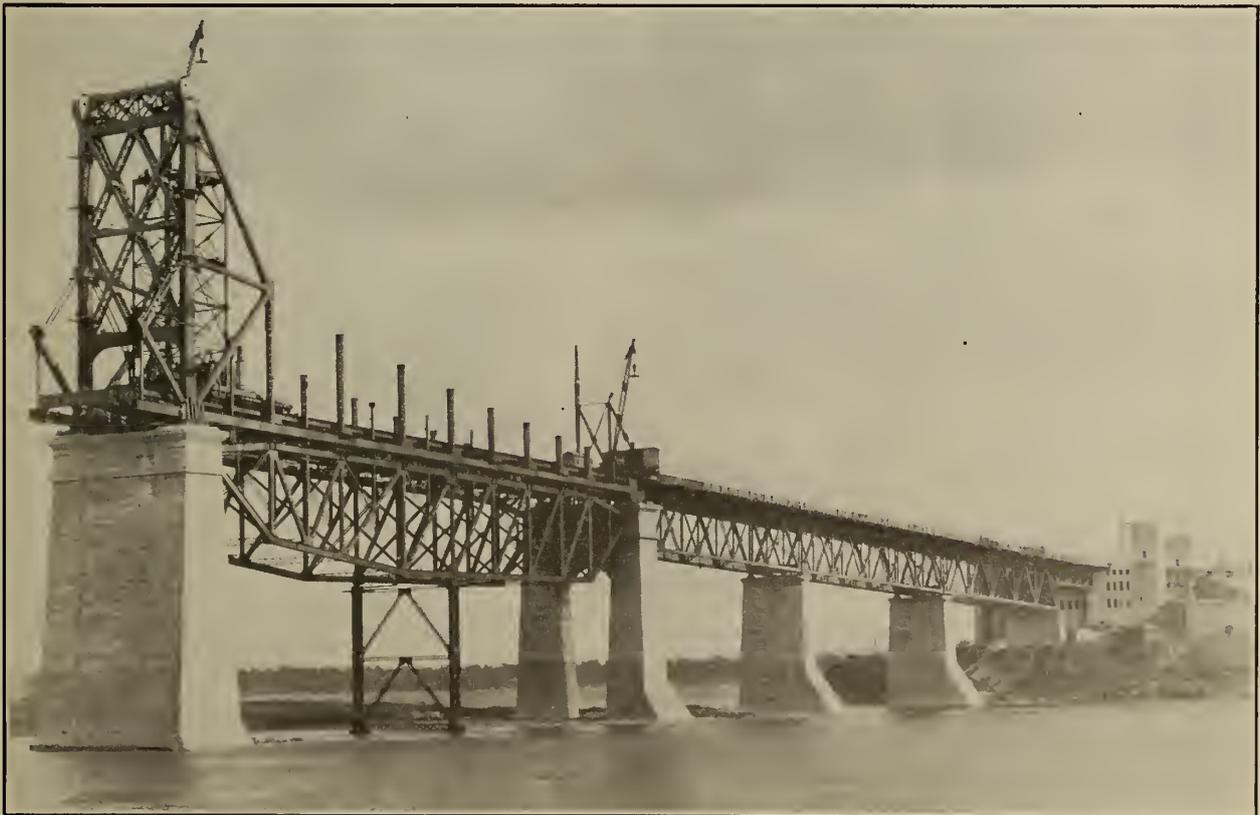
Main Span, South Side—Erection proceeding on Anchor Arm.
